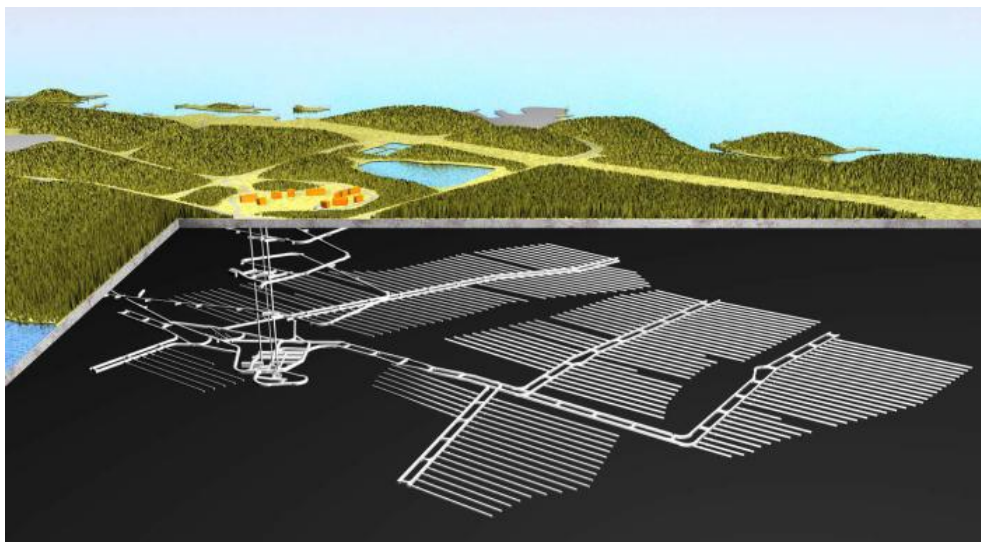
Layout of the underground facility and disposal tunnel for vertical disposal option. (POSIVA 2021)
